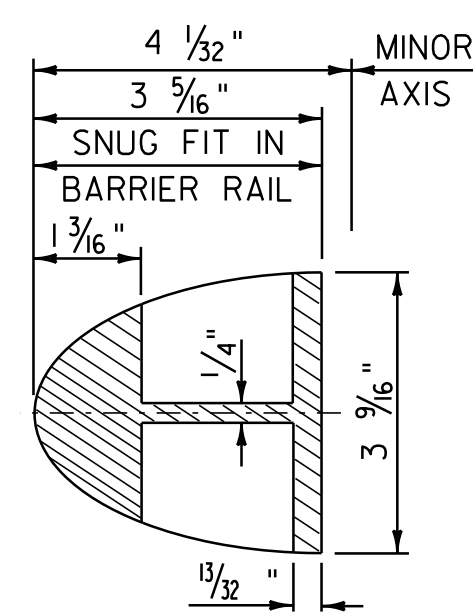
DETAIL FOR CONNECTING EXISTING ALUMINUM APPROACH RAIL TO PROPOSED HD STEEL BEAM GUARDRAIL, GALVANIZED AT BRIDGE NO. 18
